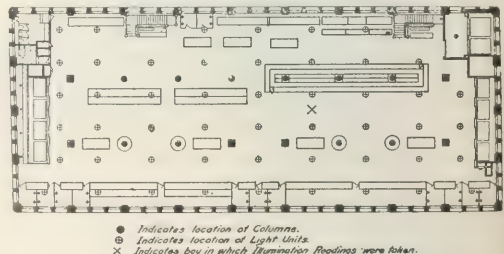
TYPICAL ARRANGEMENT ON UPPER FLOORS
